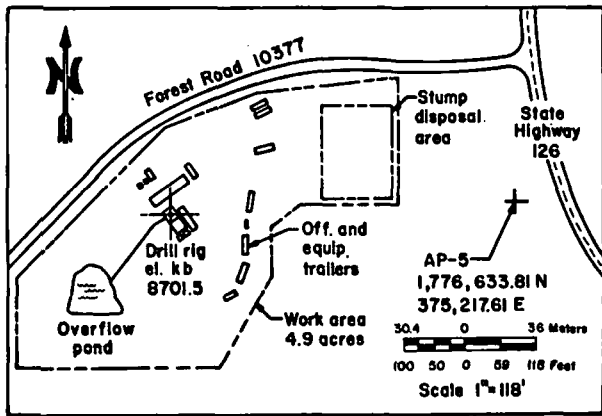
Site plan, Dry Geothermal Source Demonstration Project.
